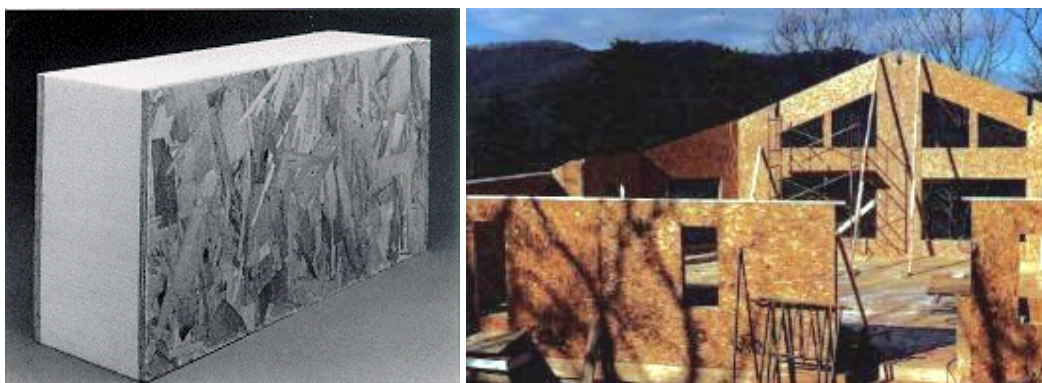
Wooden sandwich panels can be used for roofs and walls
